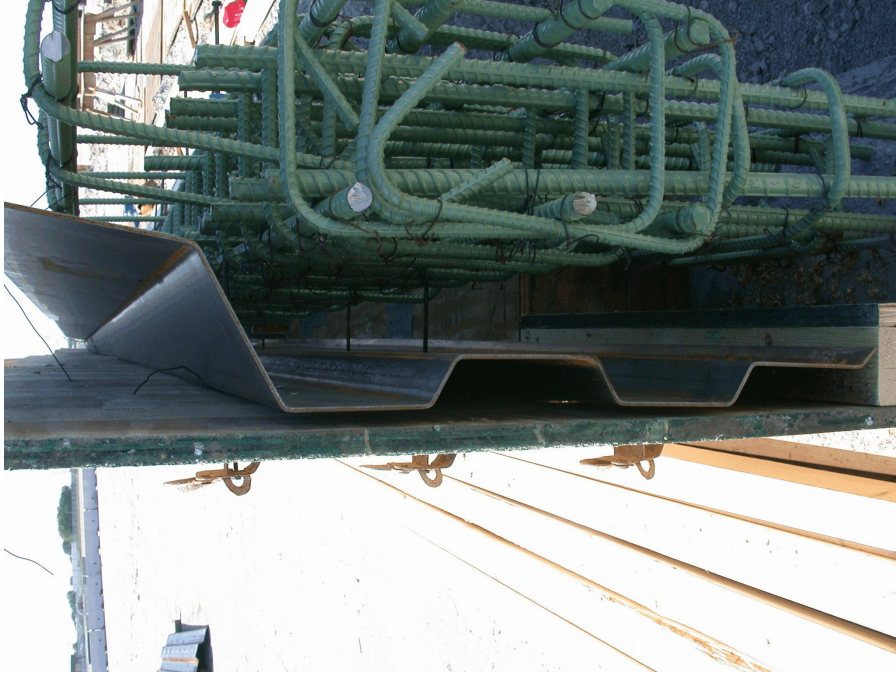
NDOR's TL-5 Aesthetic Open Concrete Bridge Rail Rebar Reinforcement
